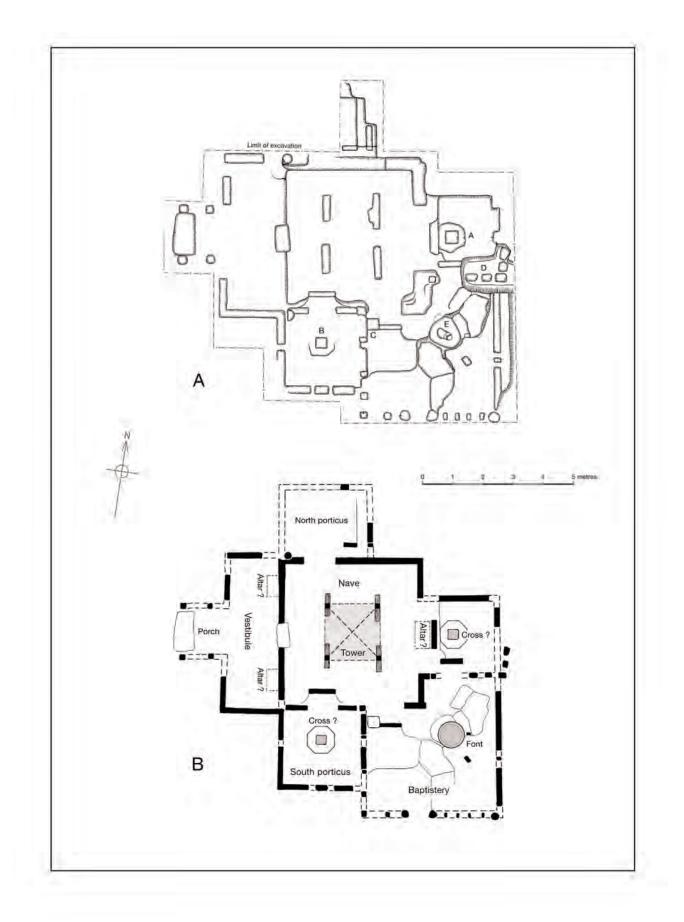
Potterne (Wilts.). Cruciform timber church found by excavation. A, excavation plan. After Davey 1964. B, interpreted foundation and function plan. Scale 1:125. Drawing: Warwick Rodwell
